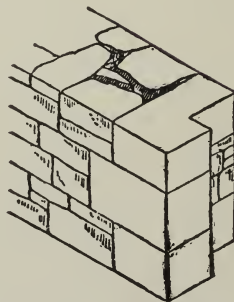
Cut-stone Window Jamb, Rubble Wall.
